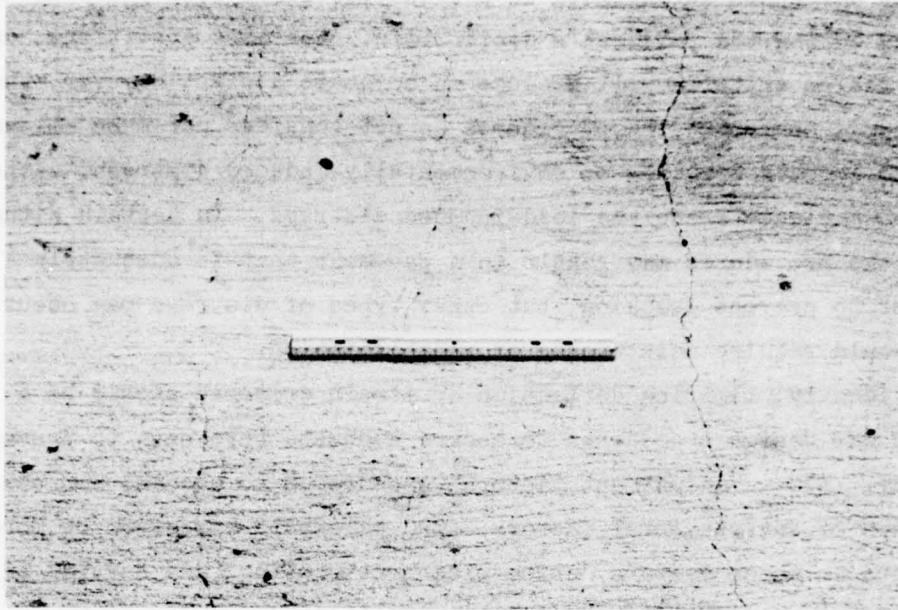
Example of closely spaced transverse cracking pattern in CRC pavement
